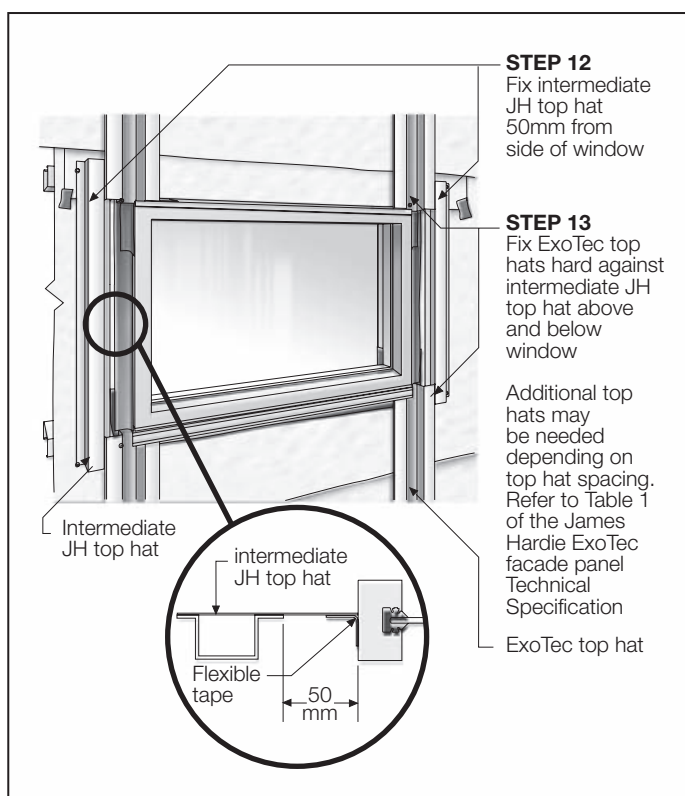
INSTALLATION OF TOP HATS AROUND WINDOW
